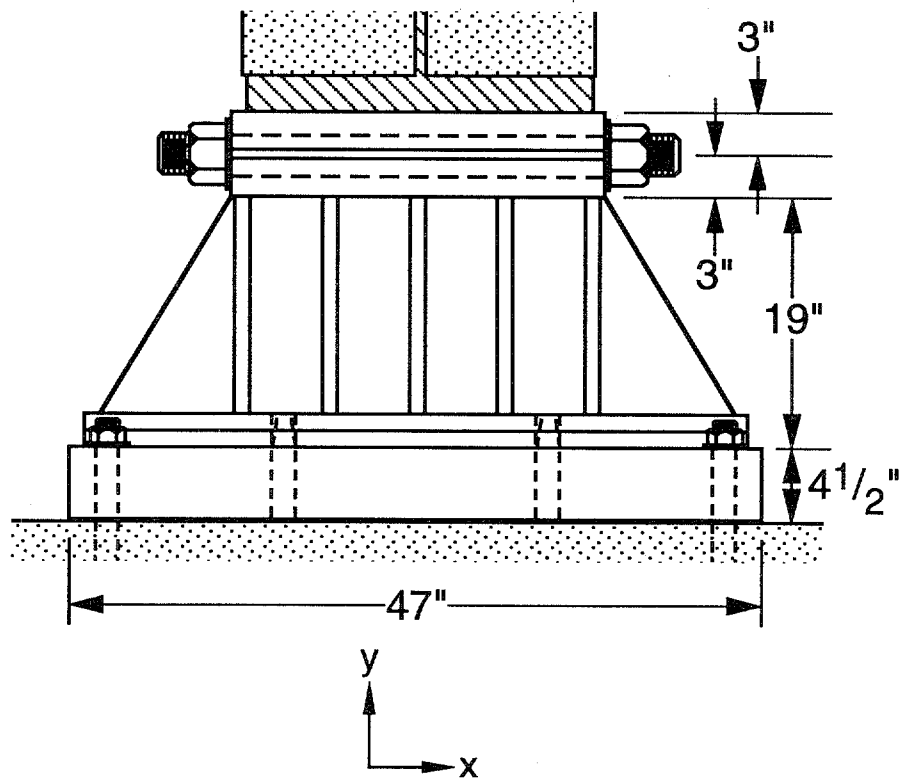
Connection detail found at the abutment and Pier 3 that allows longitudinal displacement.
